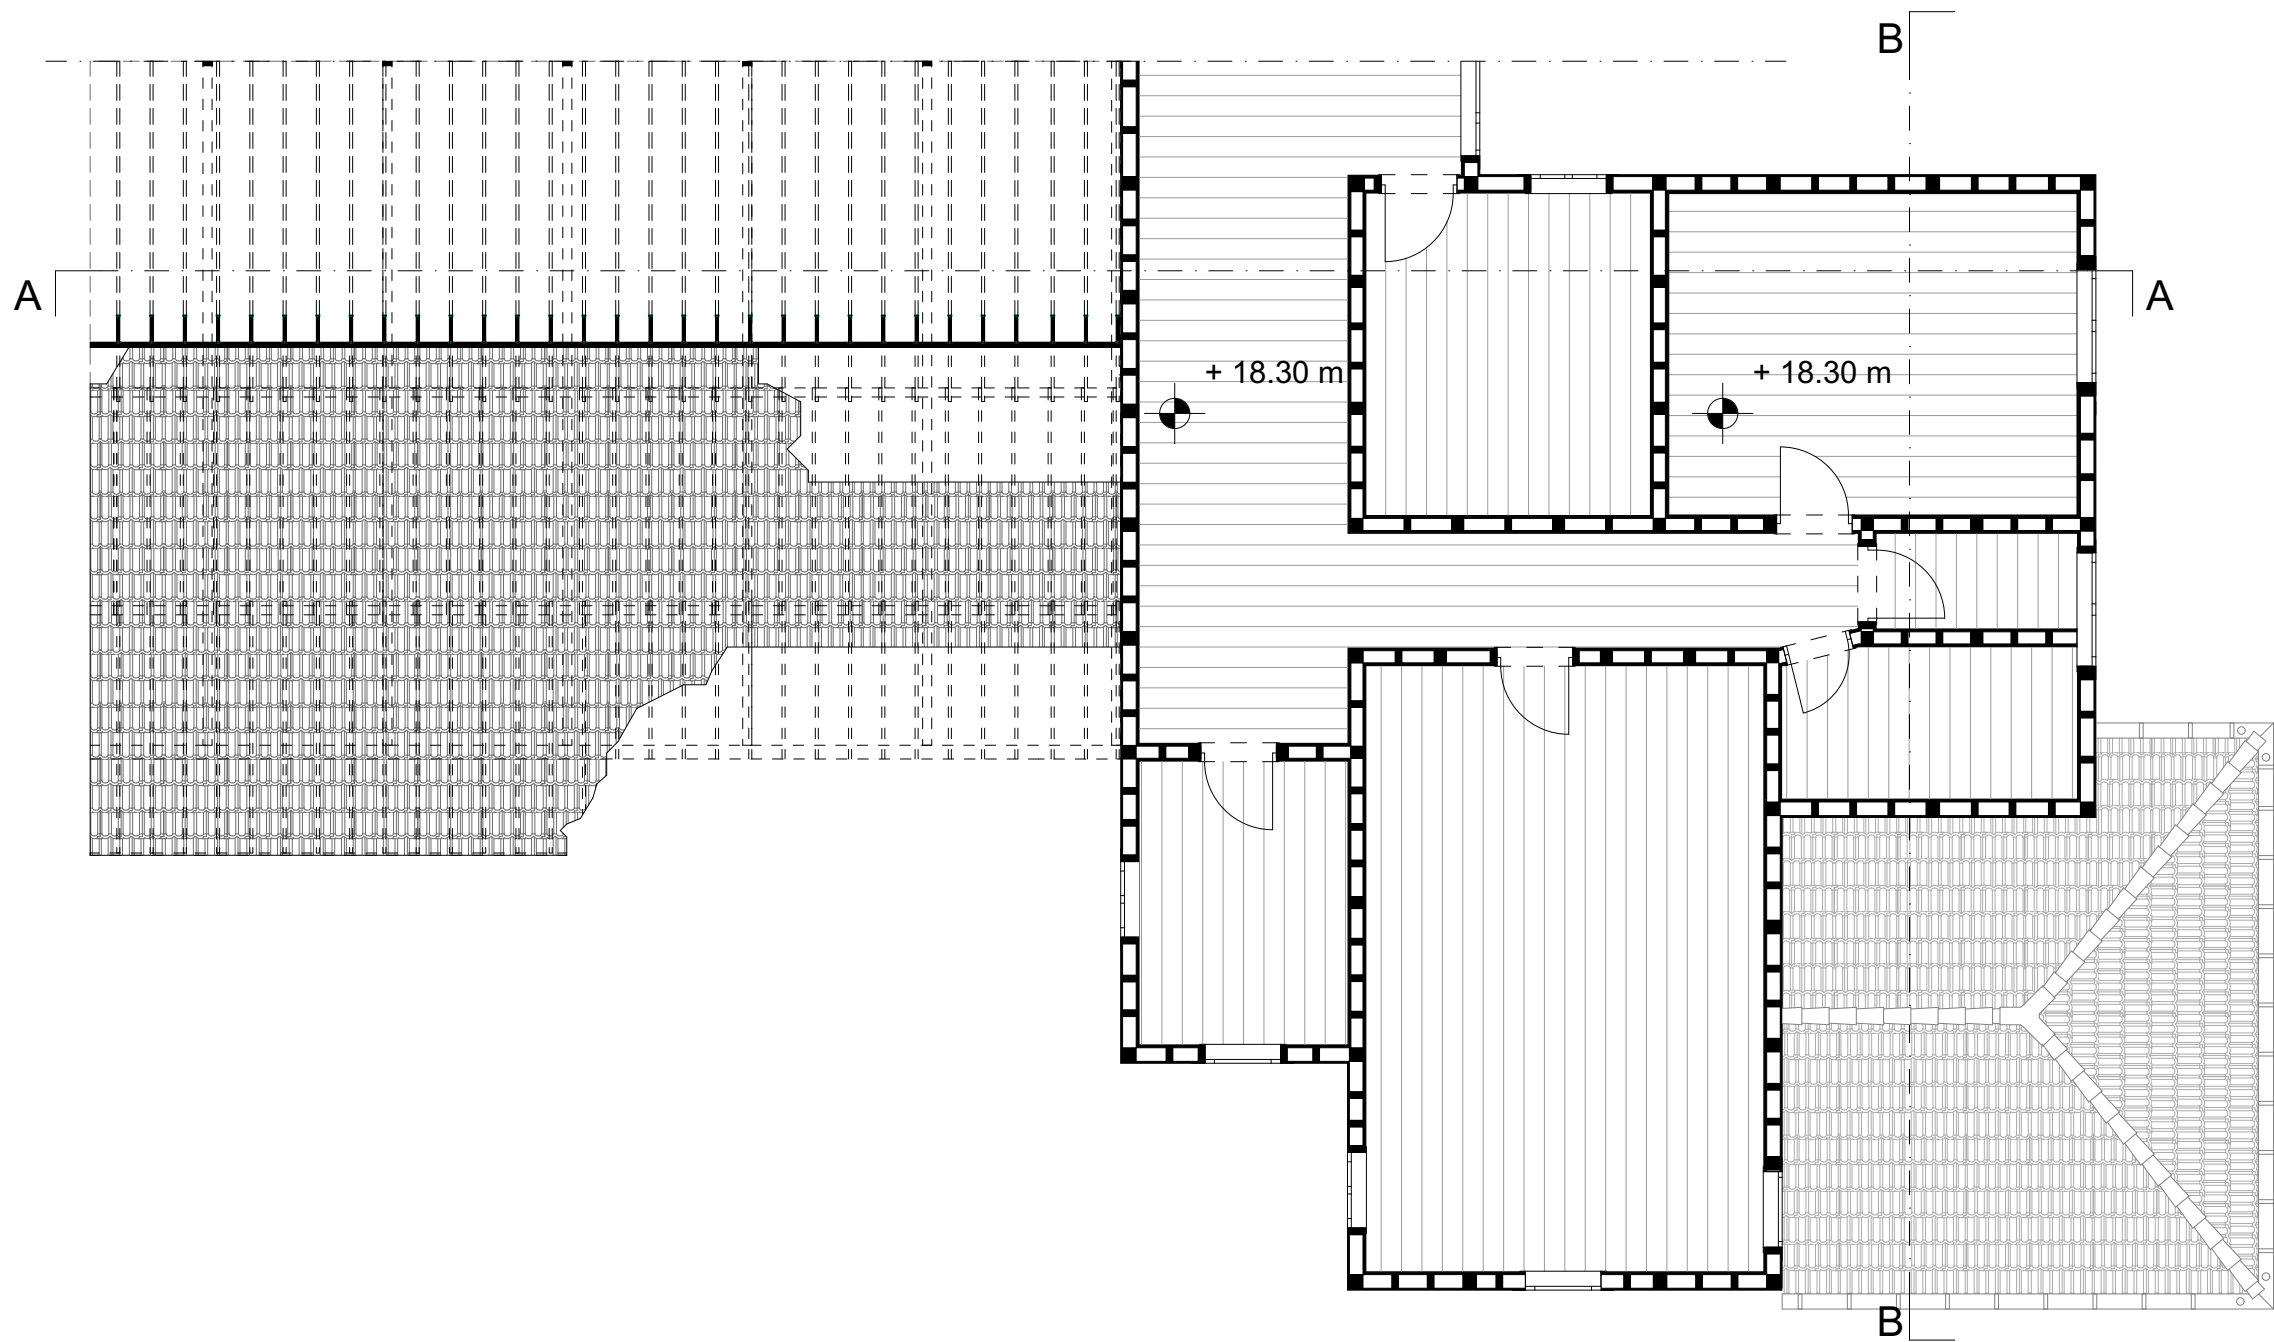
Fourth Floor Plan (Source: Created by the author, 2024)
